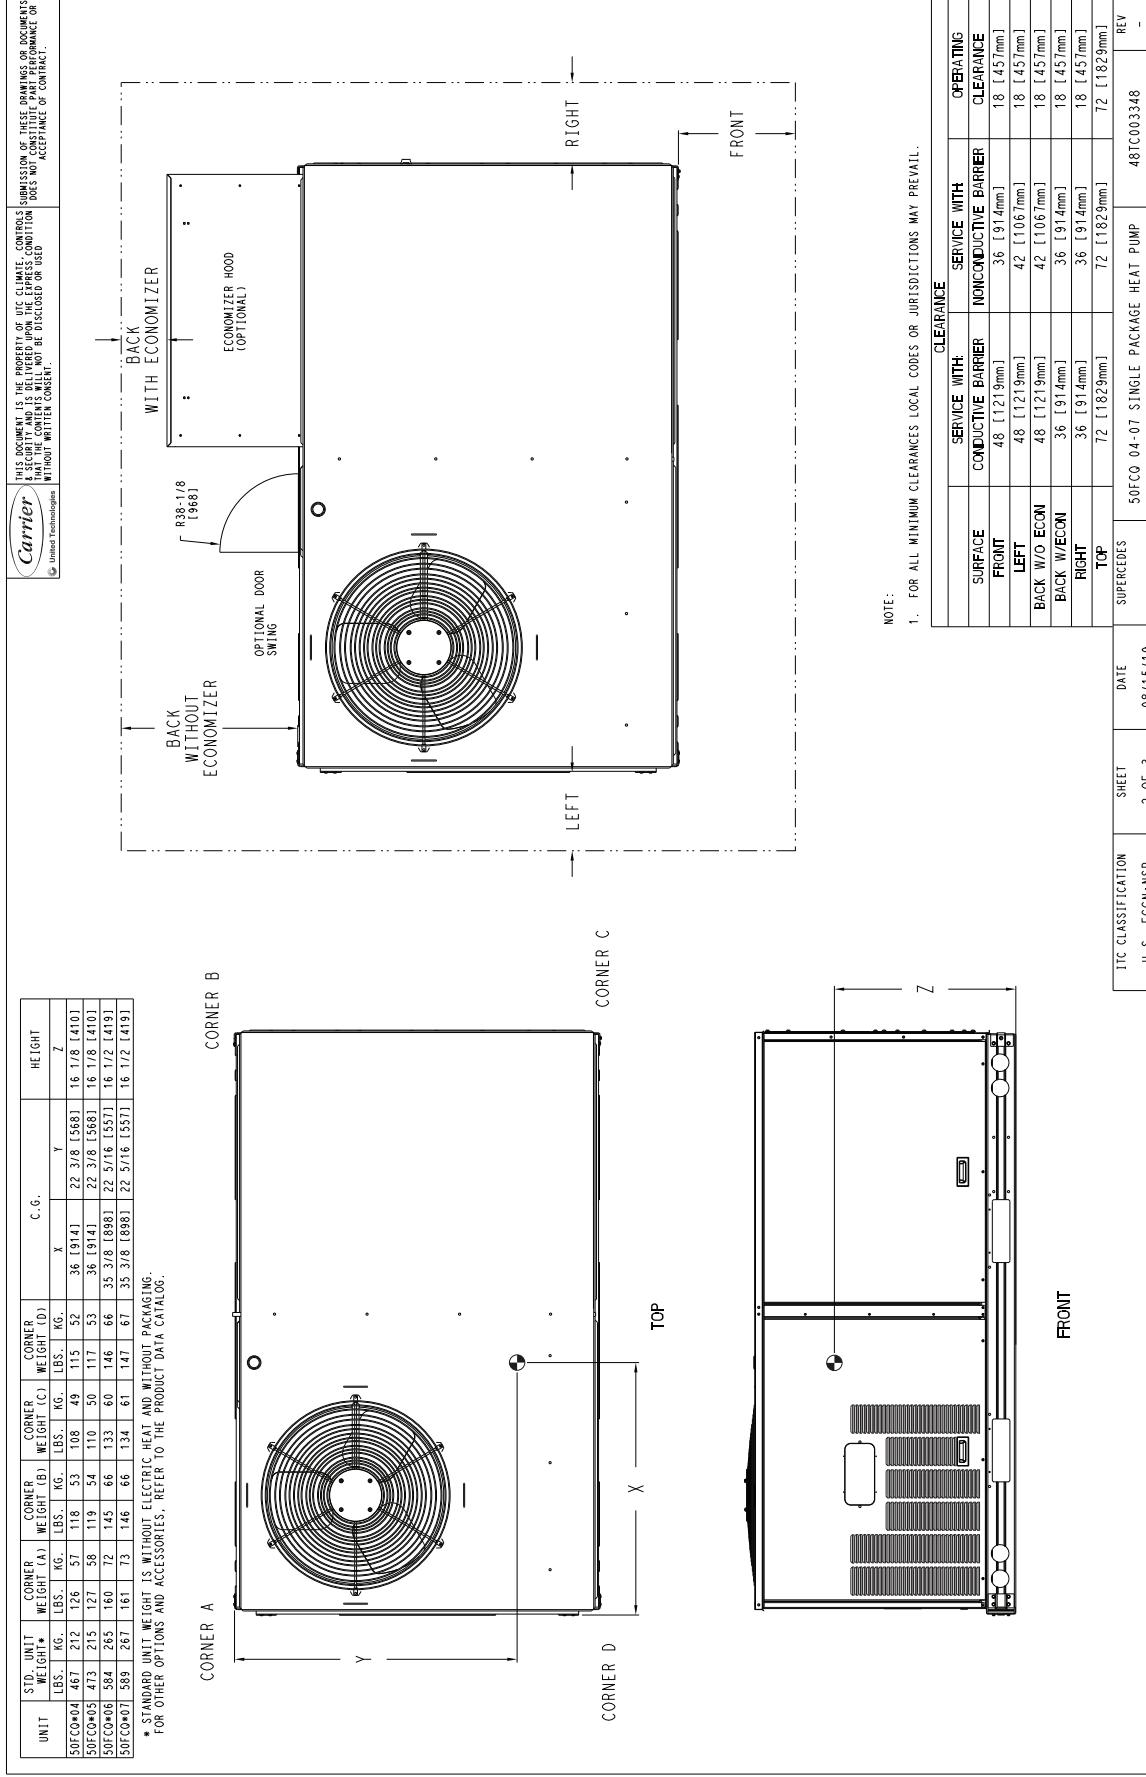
50FCQ*04-07 Dimensional Drawing (cont)
